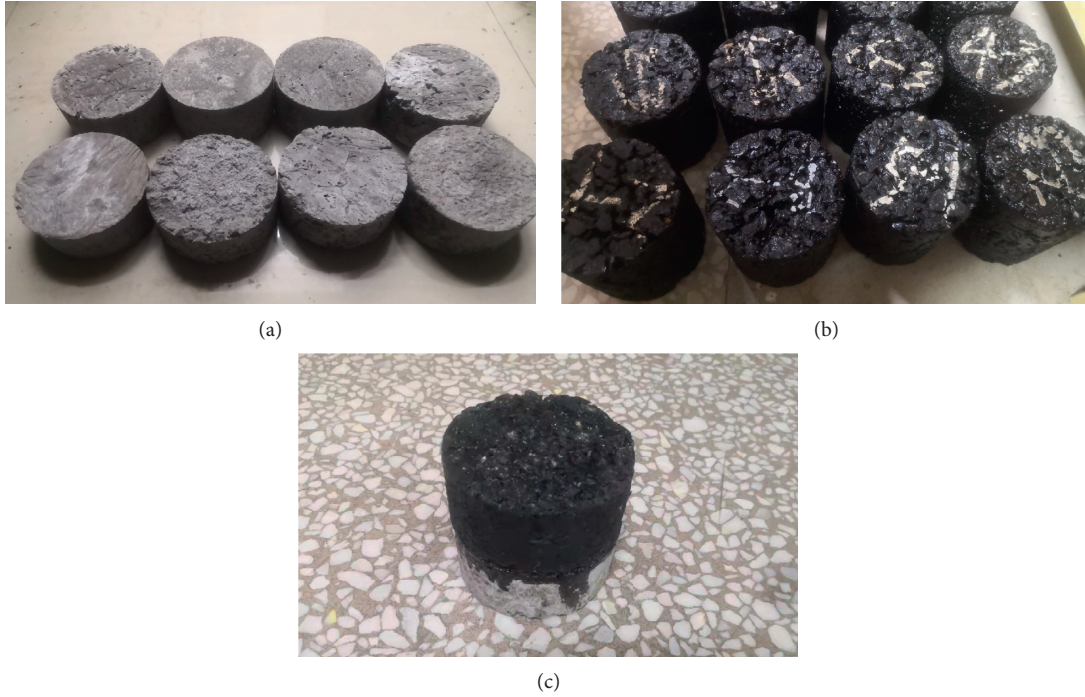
Preparation of the composite specimen. (a) Cement concrete specimens. (b) Asphalt mixture specimens. (c) Composite specimen of the cement concrete-waterproof adhesive layer-asphalt mixture.
